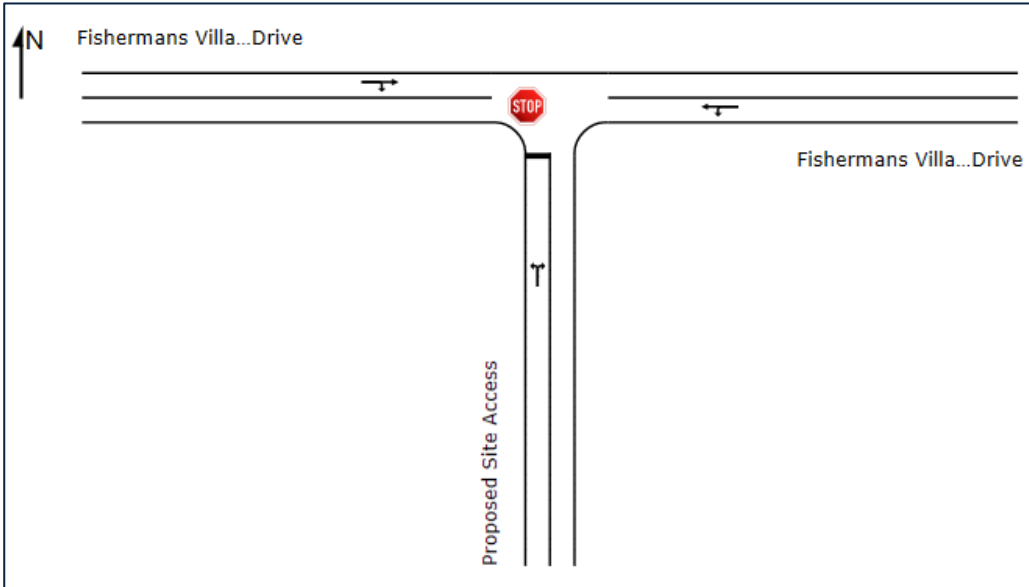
Existing Intersection Layout: Fishermans Village Drive and Proposed Site Access
